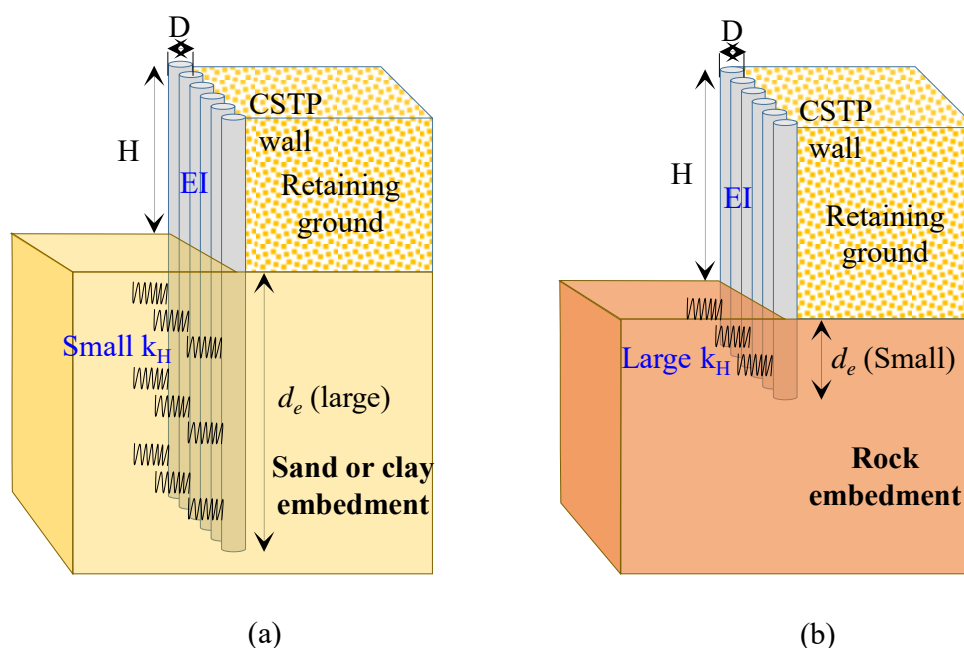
Cantilever steel tubular pile (CSTP) wall embedded in (a) soft ground and (b) rock
